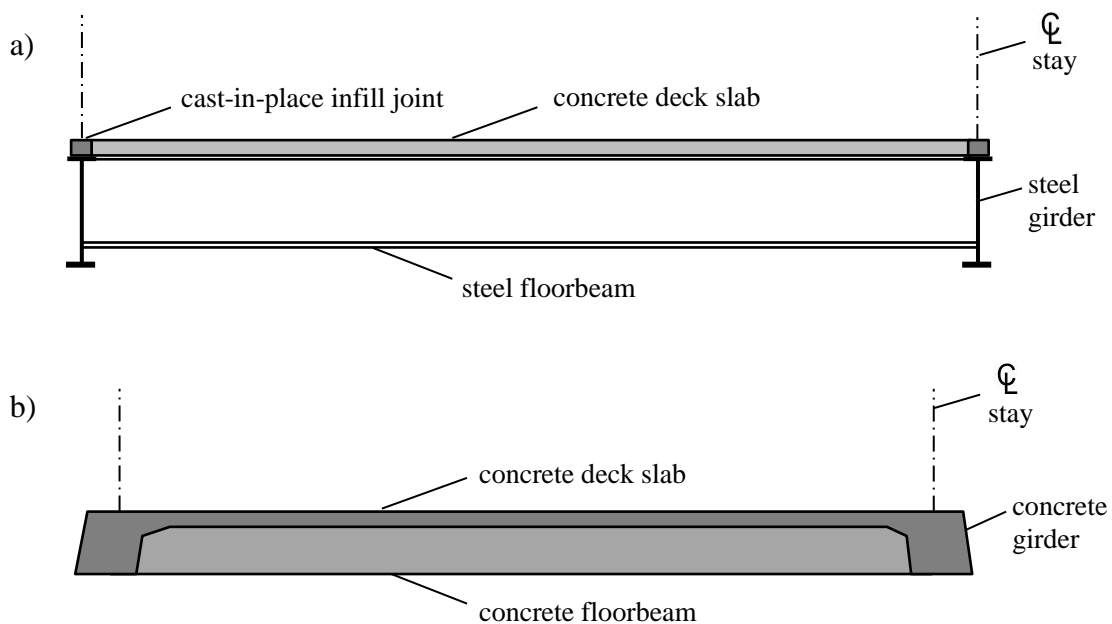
Cable-stayed bridge girder cross sections: a) composite girder system; b) concrete girder system.
